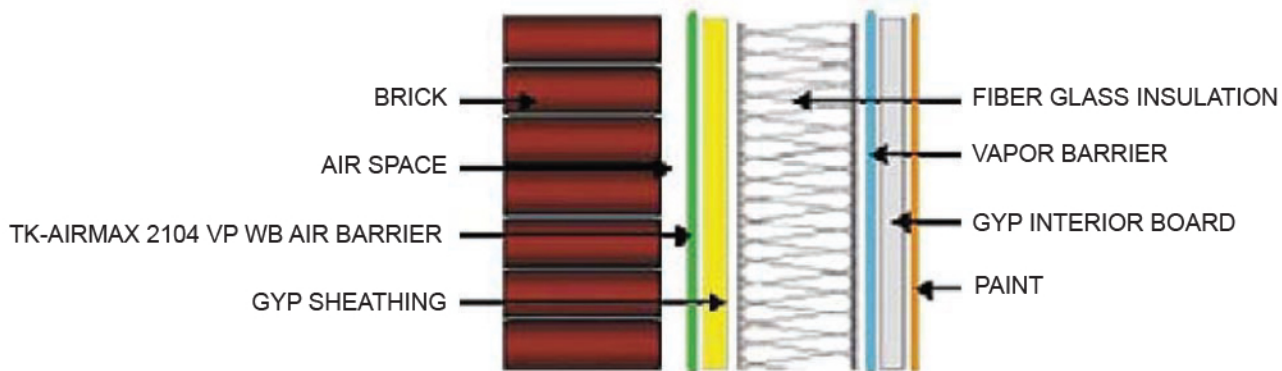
BRICK VENEER W/INSULATED STUD BACK UP WALL
